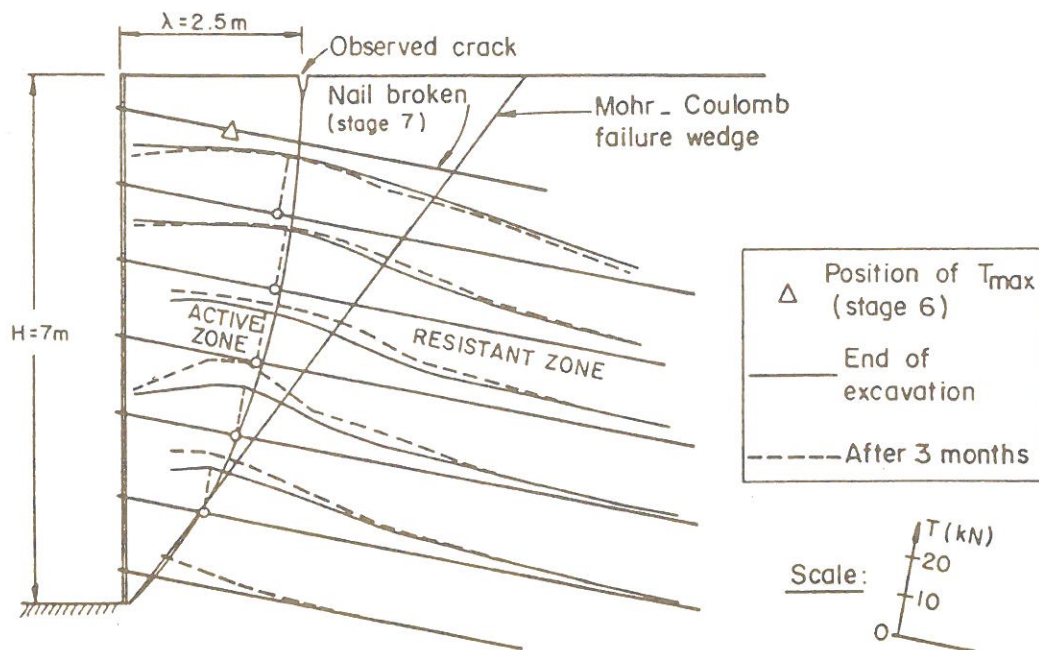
Distribution of the tensile forces in the nails of the first Clouterre full scale experiment on a soil nailed wall
